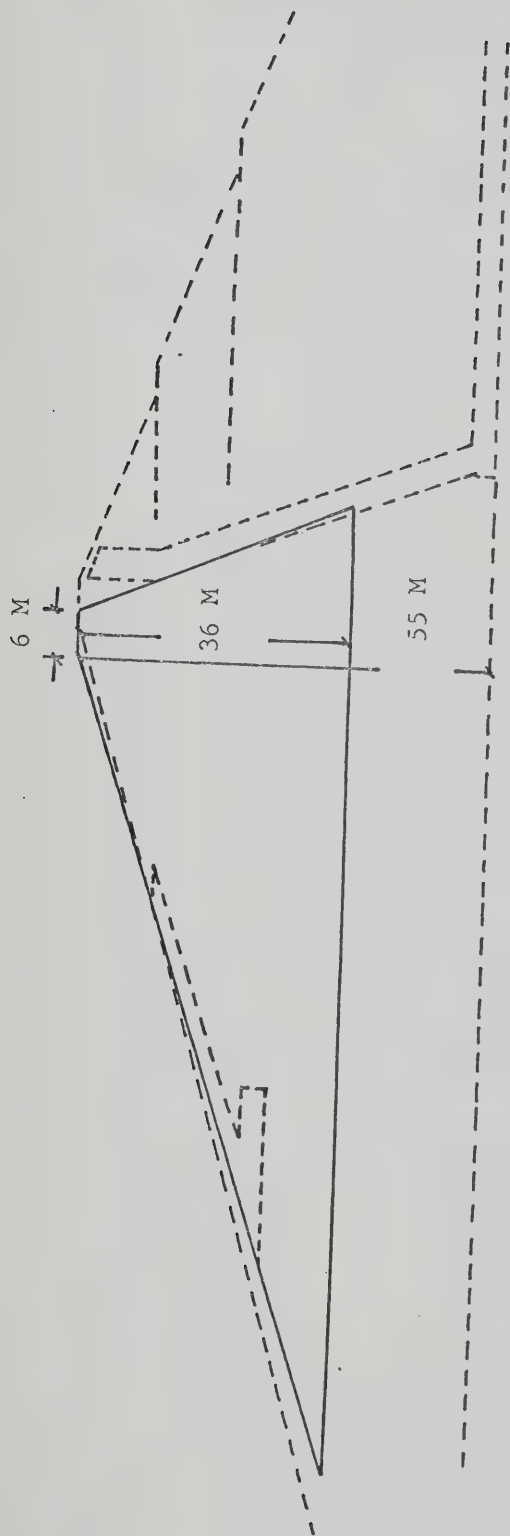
a ASSUMED CROSS-SECTION OF MIRAFLORES DAM
